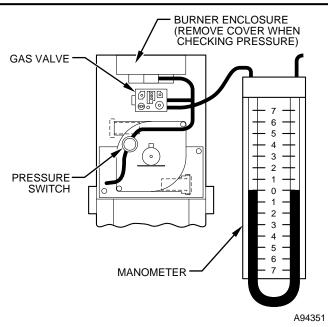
Adjusting Manifold Pressure (Manometer Attachment)
